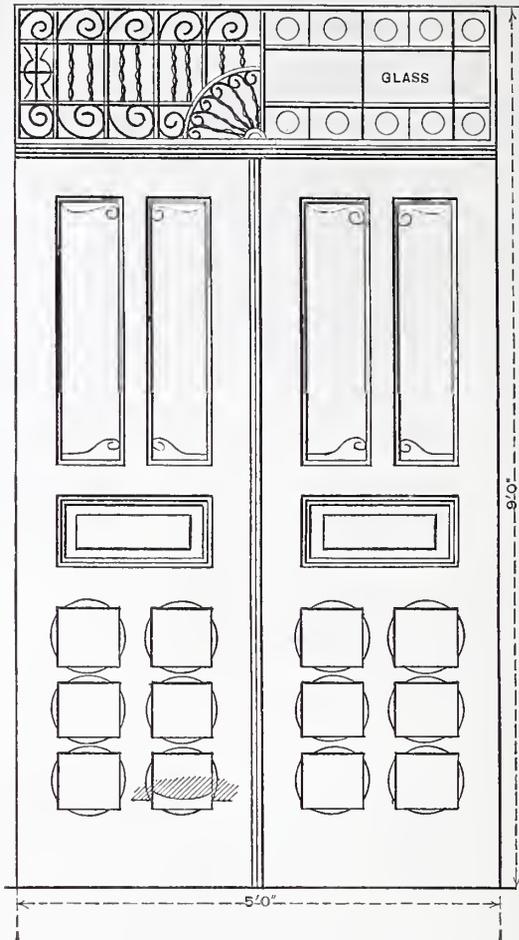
Outside Doors of Principal Entrance.—Scale, 1/2 Inch to the Foot.—The Grille is Removed From One-half of the Transom In Order To Show Glass at Back of It.
